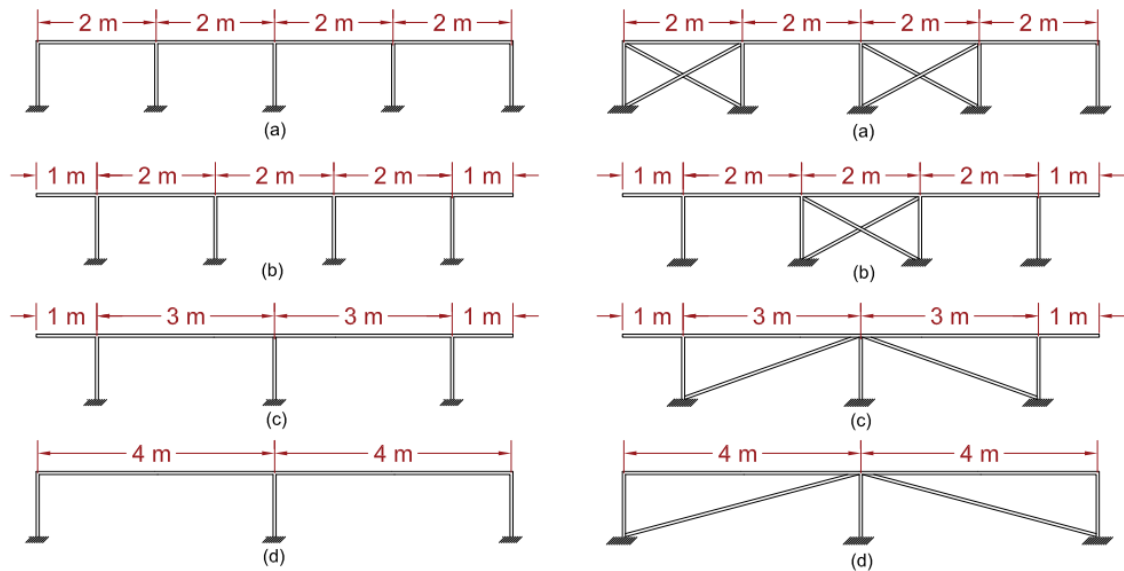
Span lengths and column arrangements for (Type I) building, (a) 2 meters (5 columns), (b) 2 meters (4 columns), (c) 3 meters, (d) 4 meters (Author)
